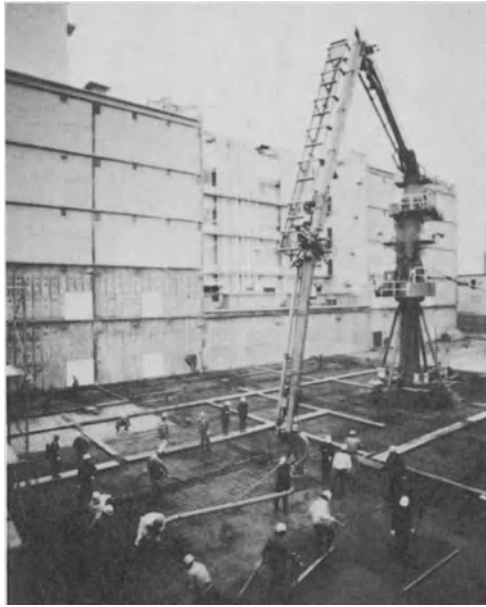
Concrete placing crane (*Ohbayashi Gumi*)
